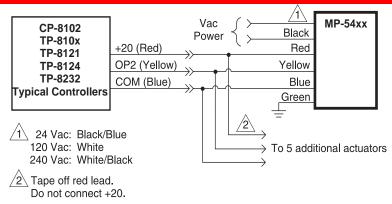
Typical Control Wiring for up to Six MP-54xx Series Actuators to Controllers Requiring External 20 Vdc Power Supply.
